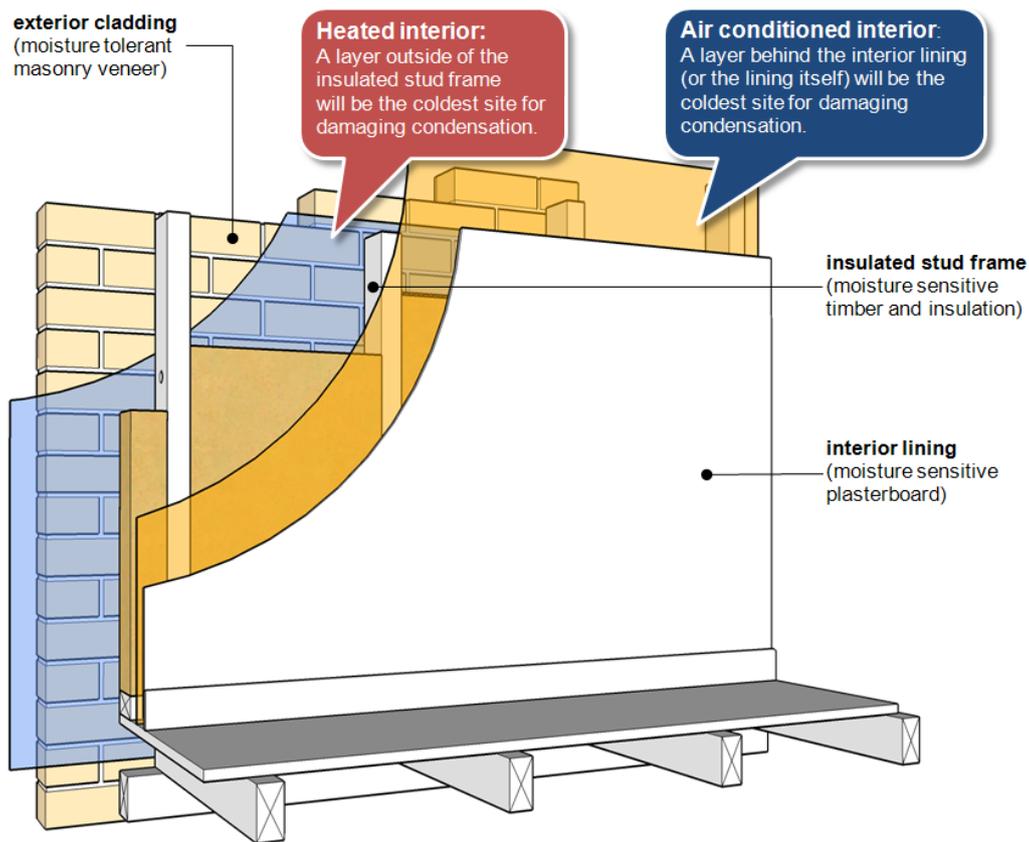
Typical masonry veneer construction (Source: ABCB Condensation in Building Handbook)
